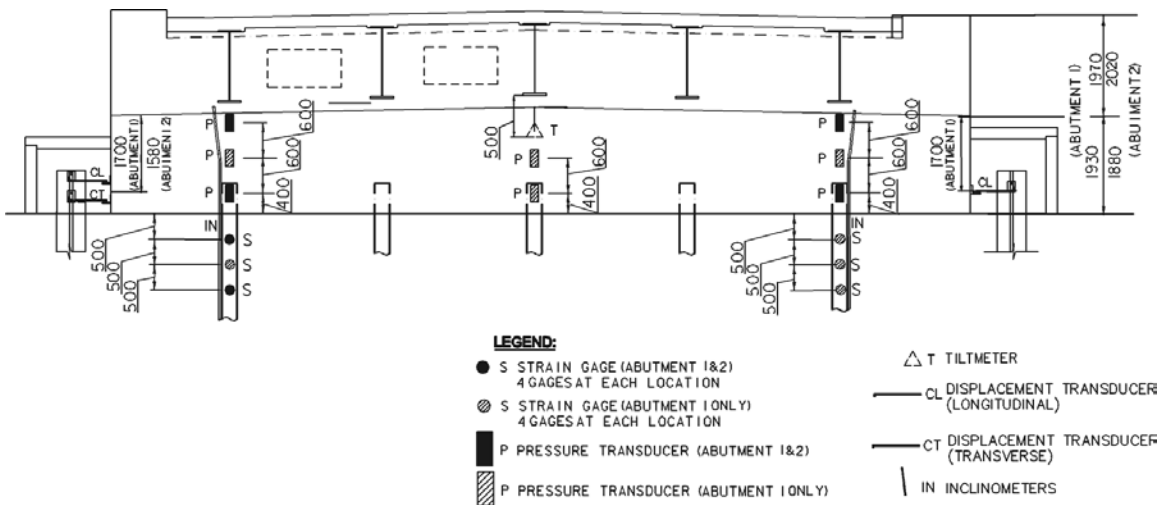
Abutment Instrumentation at East Montpelier Bridge
